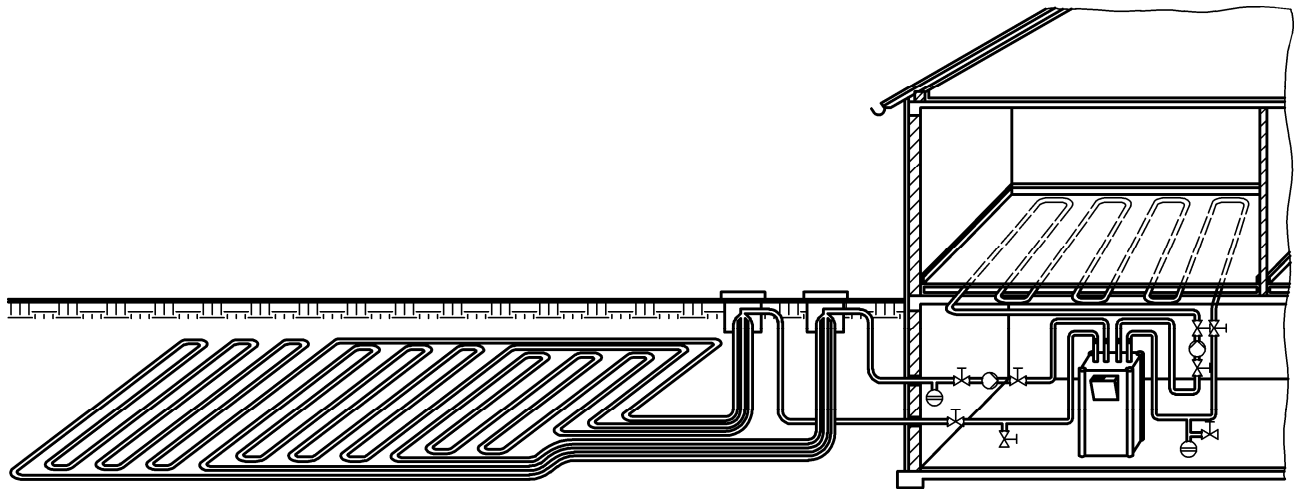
Heat pump heating system with horizontal located heat exchanger
